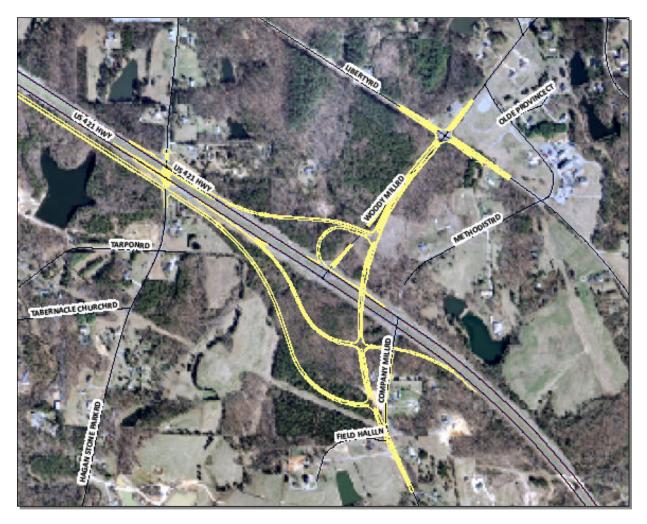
Proposed Interchange at Woody Mill Road and US Highway 421
